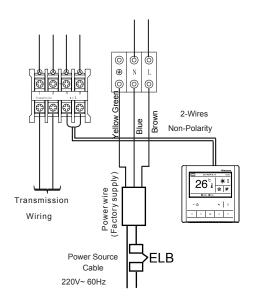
Wiring Connection for Electrical Box and Terminal Board
